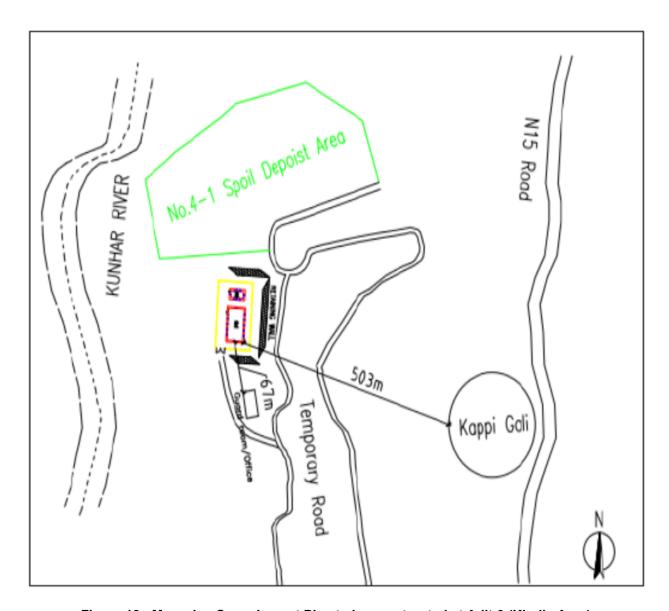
Magazine Camp Layout Plan to be constructed at Adit-3 (Kholia Area)
